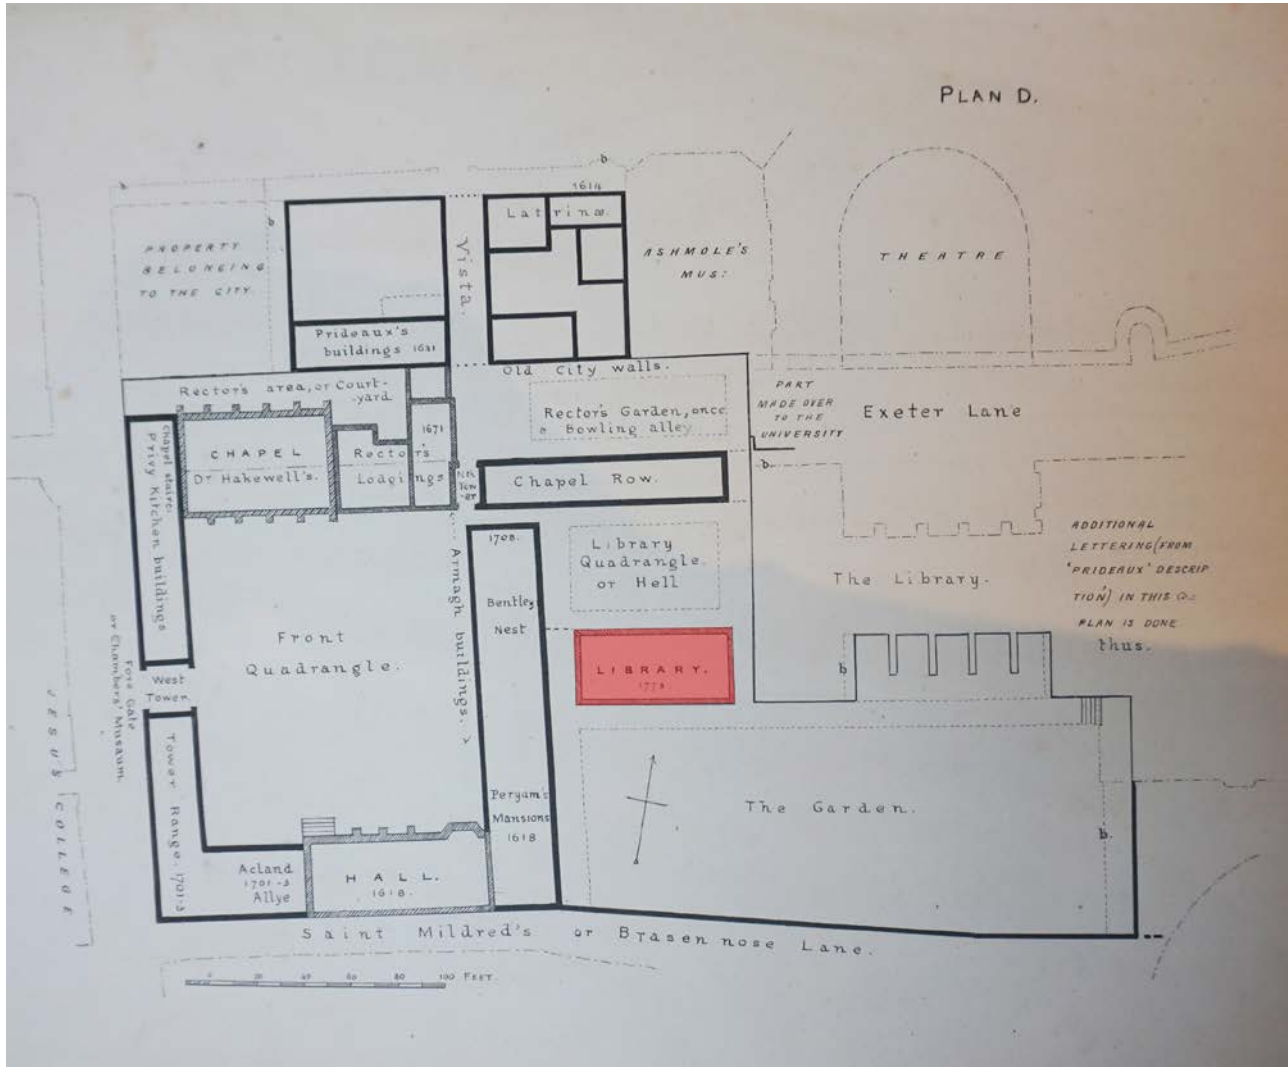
c.1780 site plan showing the location of the Library built in c.1778 by the architect John Townsend (Exeter College Archive)
